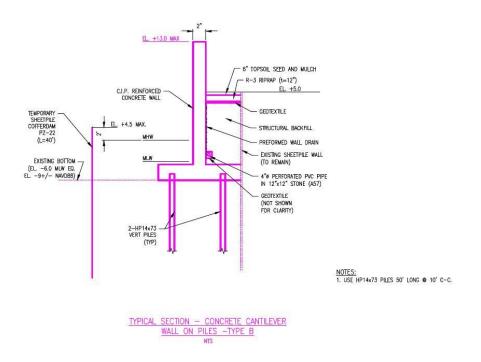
Typical Section – Concrete Cantilever Wall on Piles – Type B
